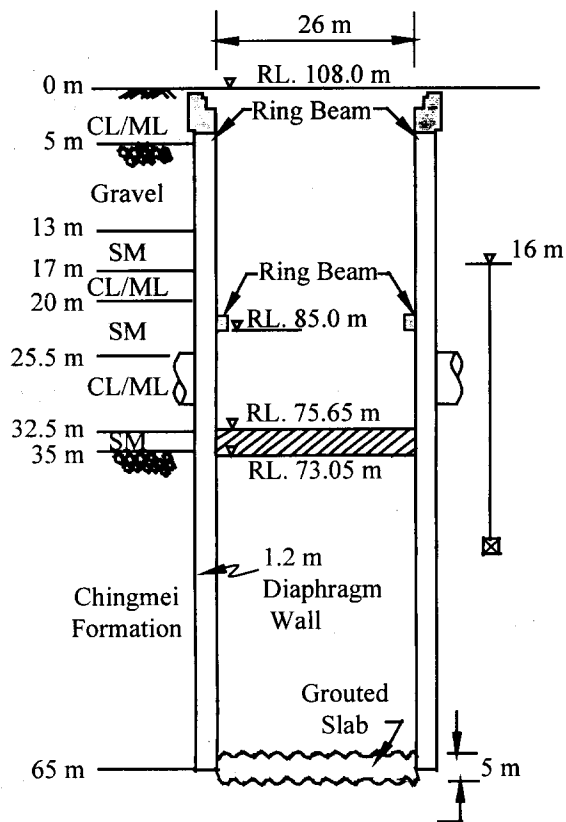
Grouted plug at Ventilation Shaft in Contract CH221
